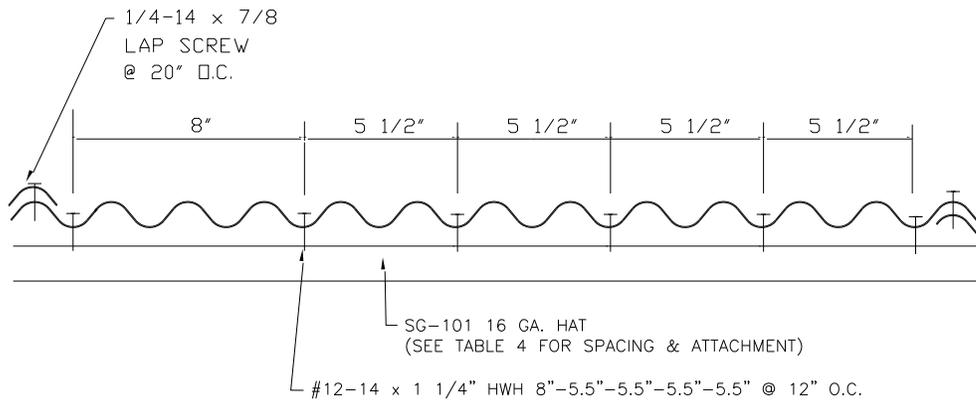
Cor Span Metal Roofing Panel Secured to SG-101 16 gauge steel hat purlins
